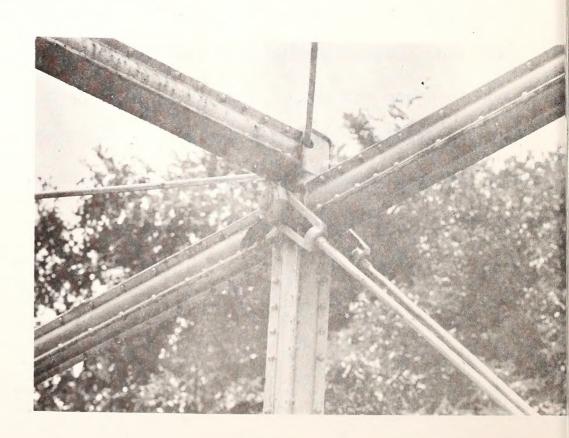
Right, Haywood #79 is the oldest truss bridge in North Carolina.
